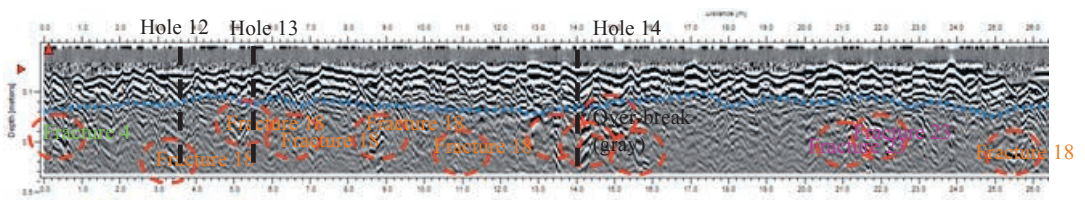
Ground Penetrating Radar on the left wall in section 0/848 to 0/827 in tunnel 214.
